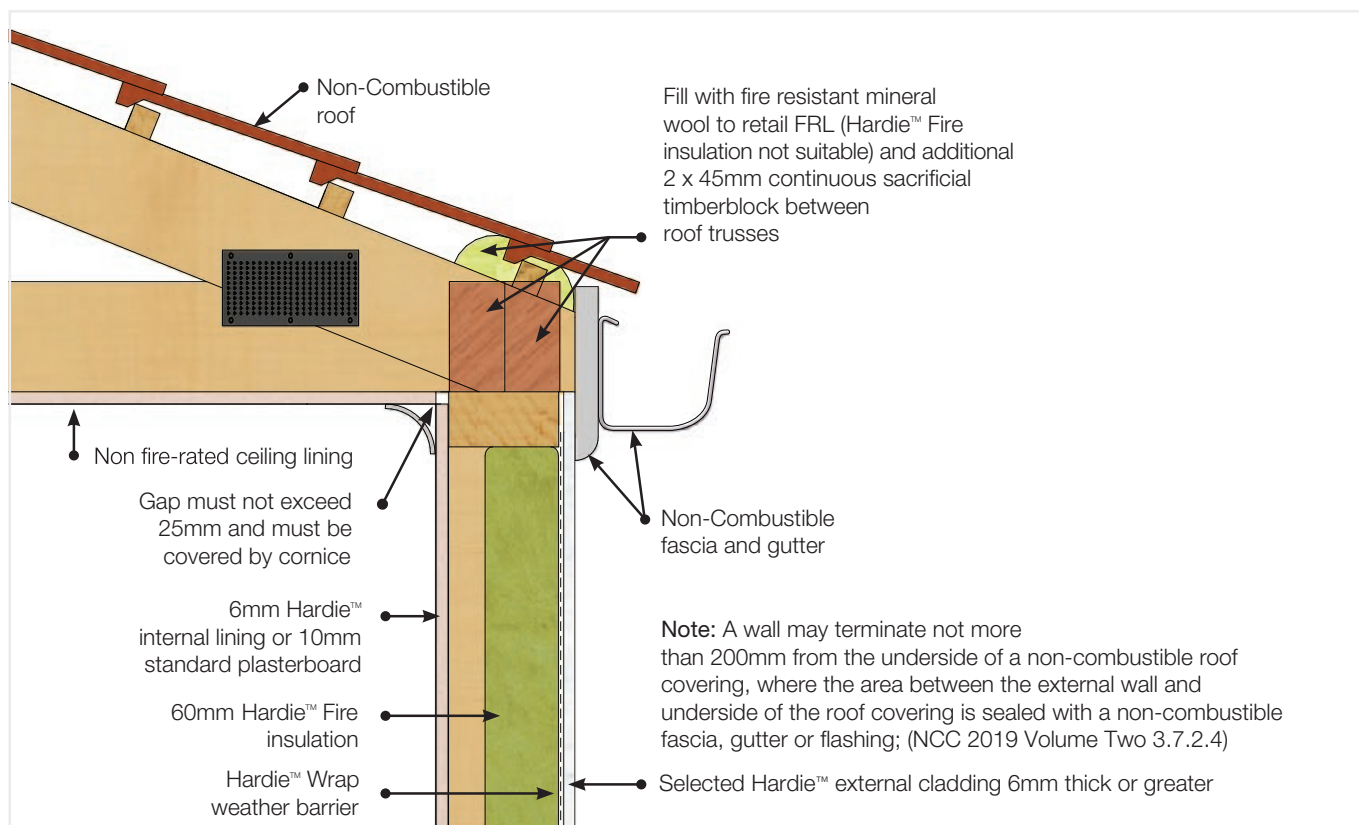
EXTERNAL BOUNDARY WALL TO ROOF
